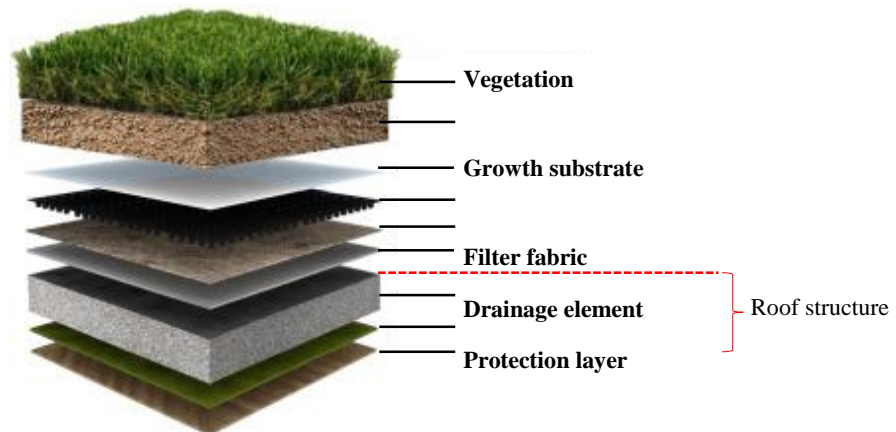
Schematics of green roofs components Source: (Vijayaraghavan, 2016)
